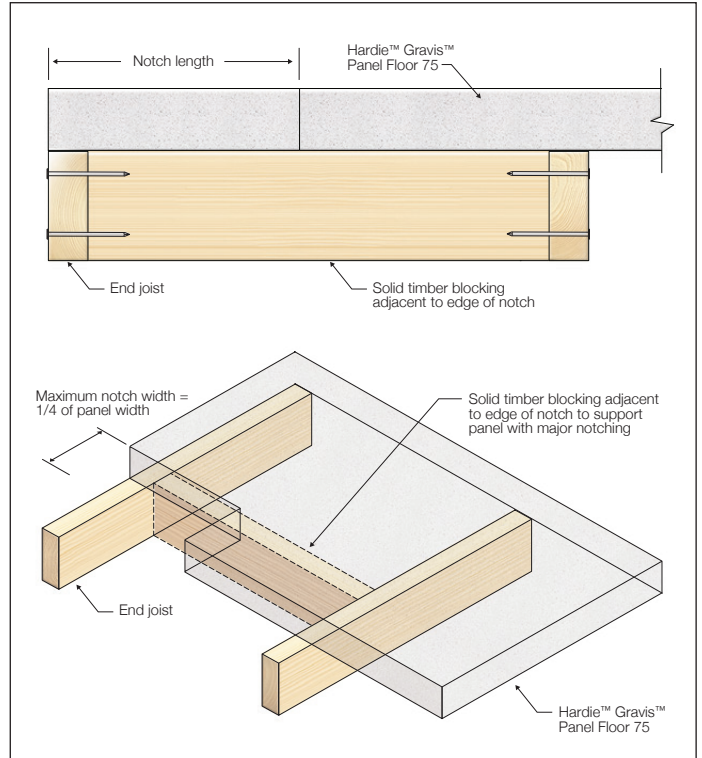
FLOOR WITH BLOCKING FOR CORNER NOTCHING
